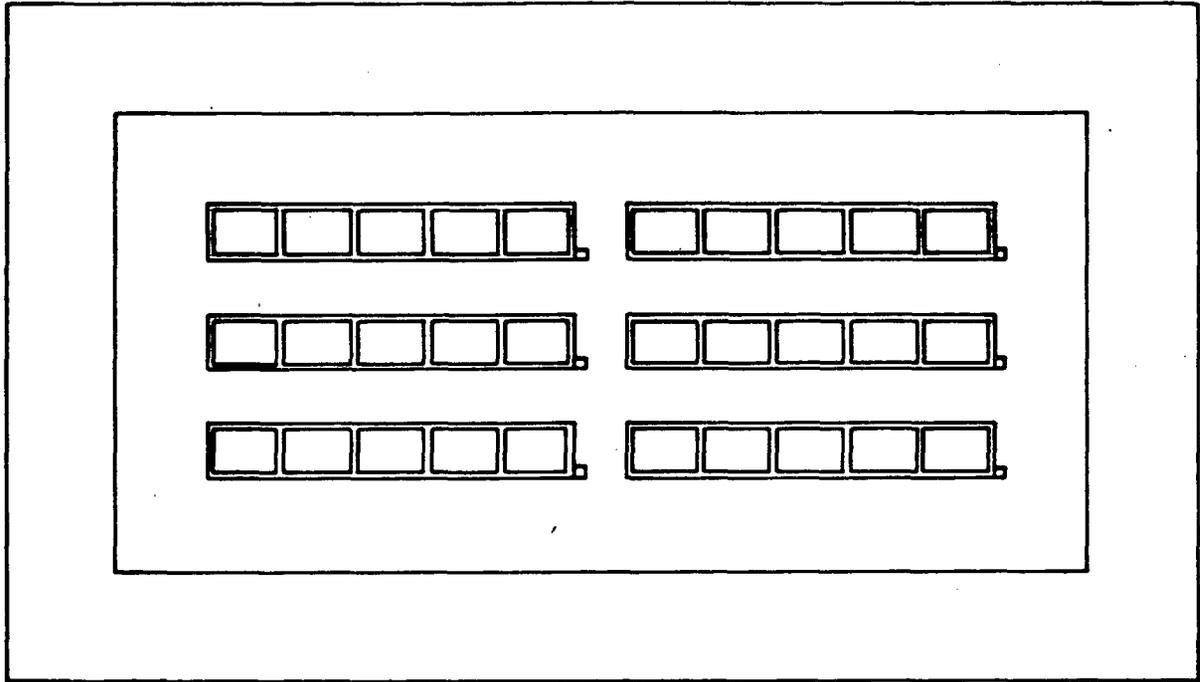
Layout of Concrete Slit Trench Disposal Concept
